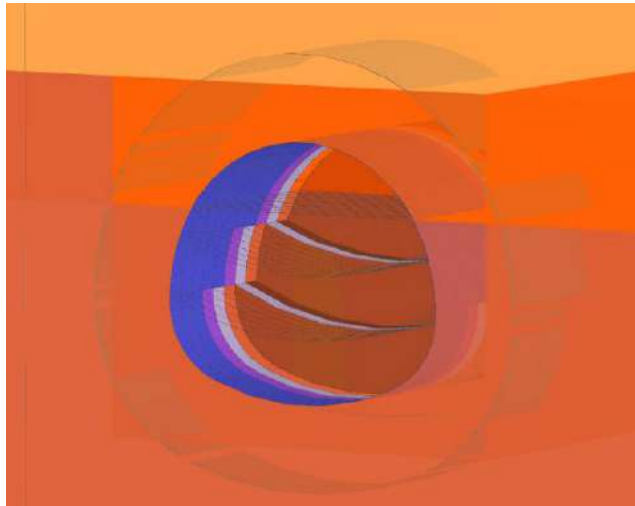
3D model of Moimesti Tunnel showing the sequential excavation with top heading, bench, and invert.
